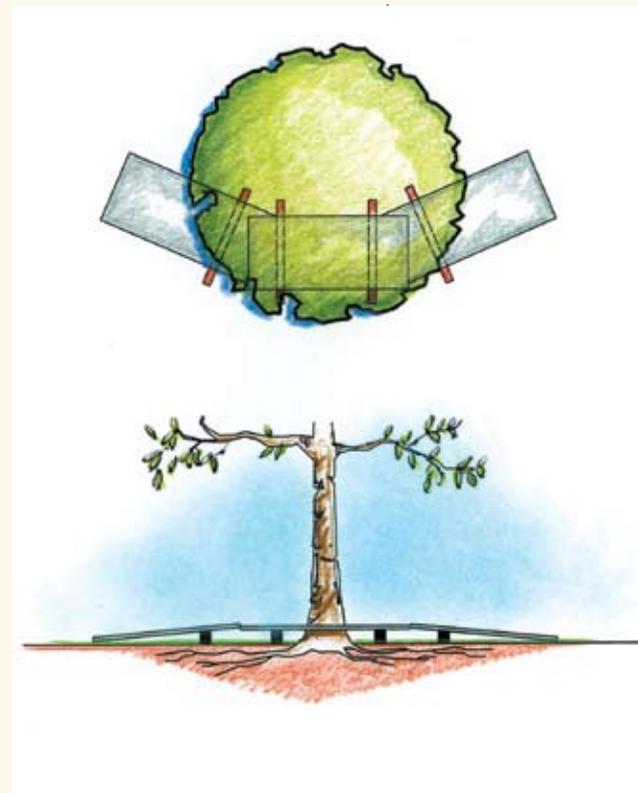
Temporary root zone bridge constructed of cross-ties and steel plates to prevent compaction.
